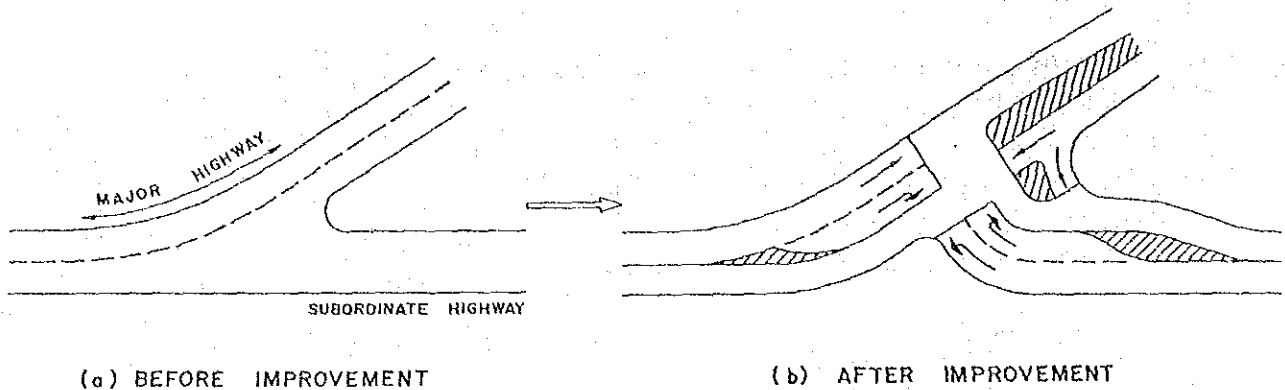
Connecting a Subordinate Highway at a Y Intersection
